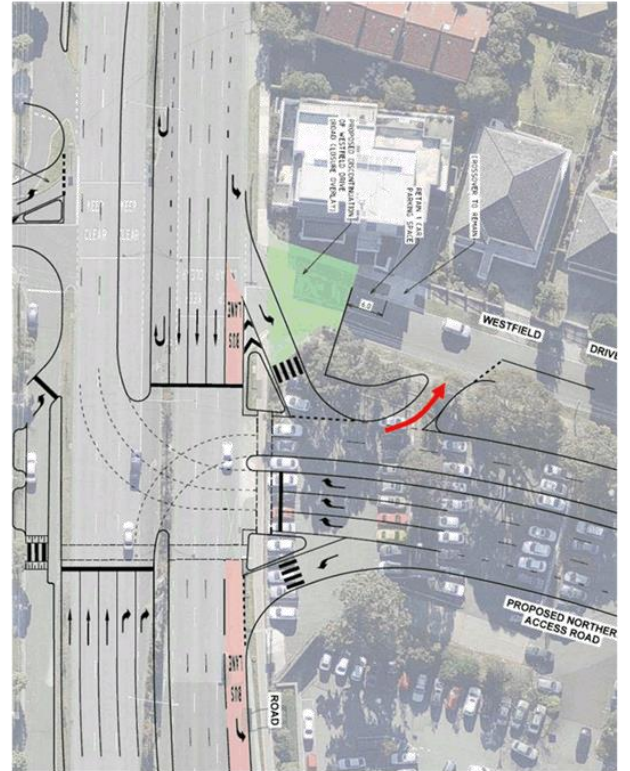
Configuration of Williamson's Road and Proposed Northern Access Road
